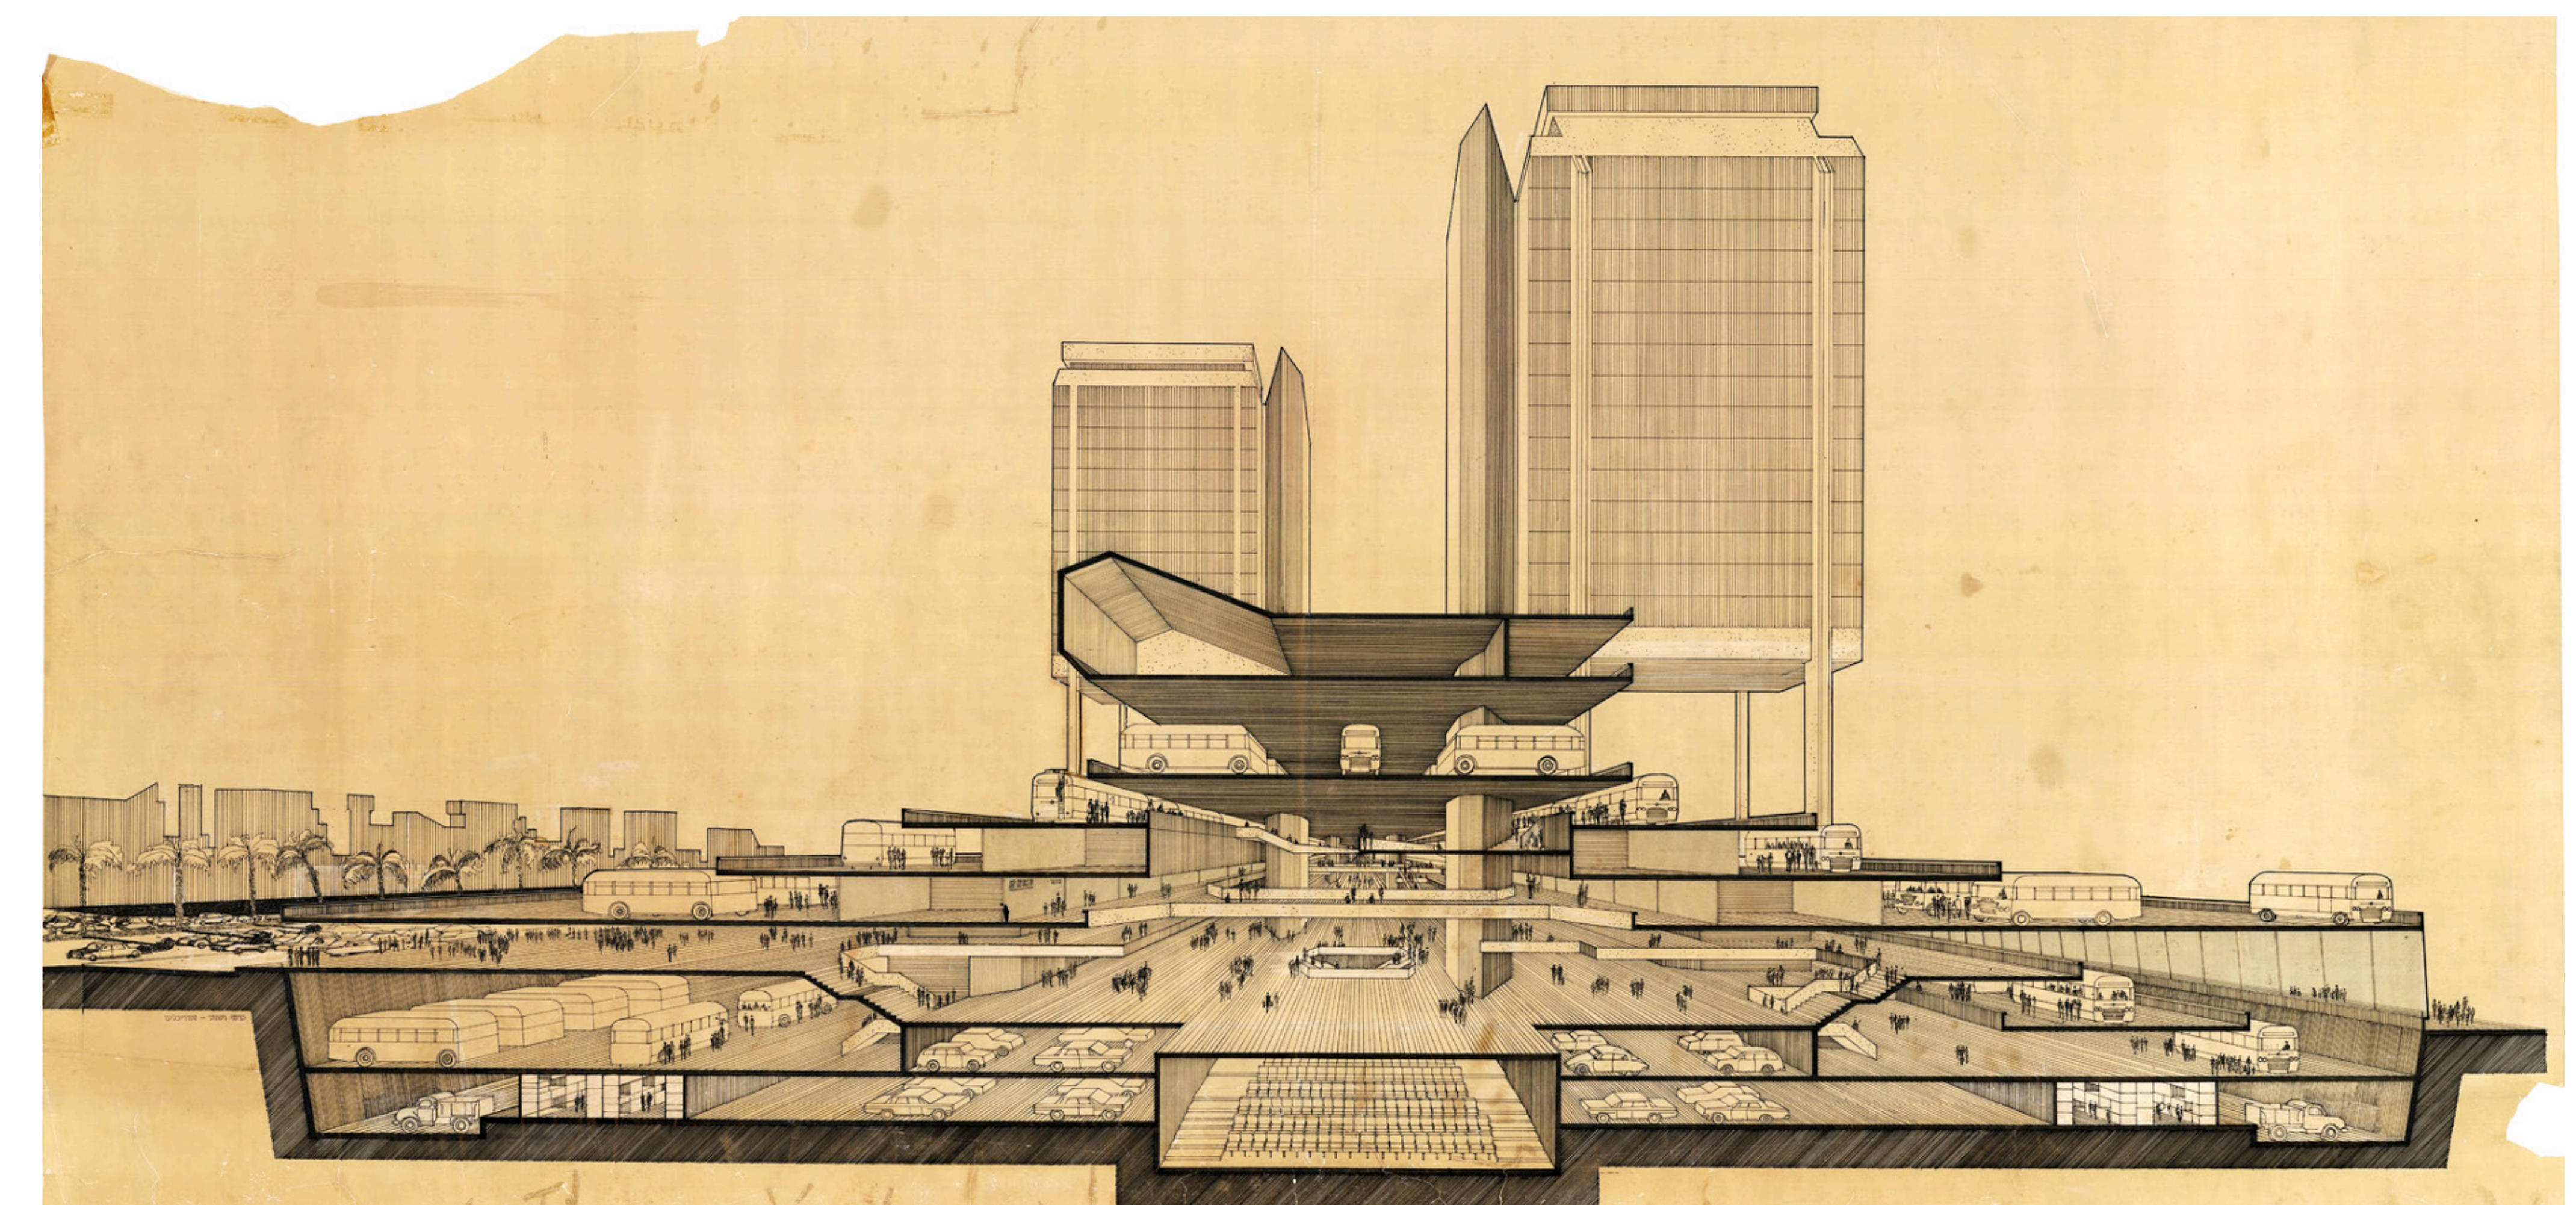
The Central Bus Station, Third design iteration, Ram Carmi, 1965 (Carmi Collection, Azrieli Archive, Tel Aviv Museum)
